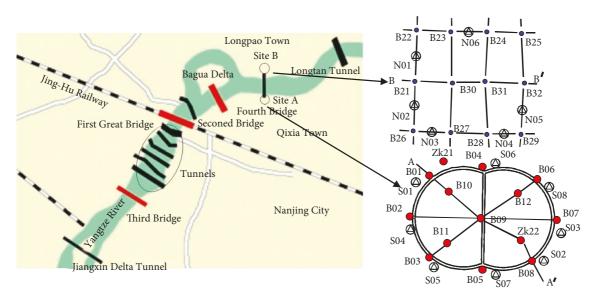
Layout of existing bridges and new alignments crossing the Yangtze River and location of the study area.
